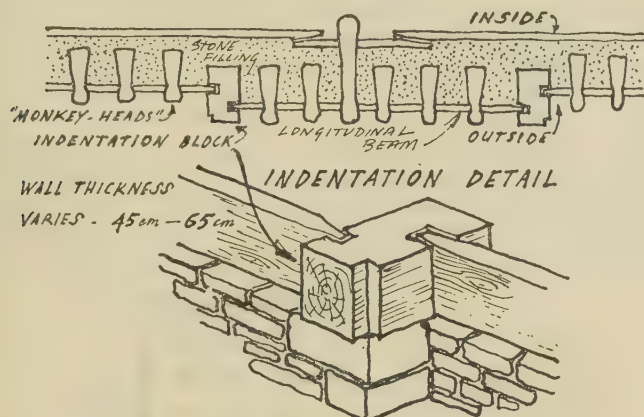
WALL CONSTRUCTION, SHOWING ARRANGEMENT OF LONGITUDINAL TIMBERS, 'MONKEY HEADS' AND QUOIN BLOCKS
